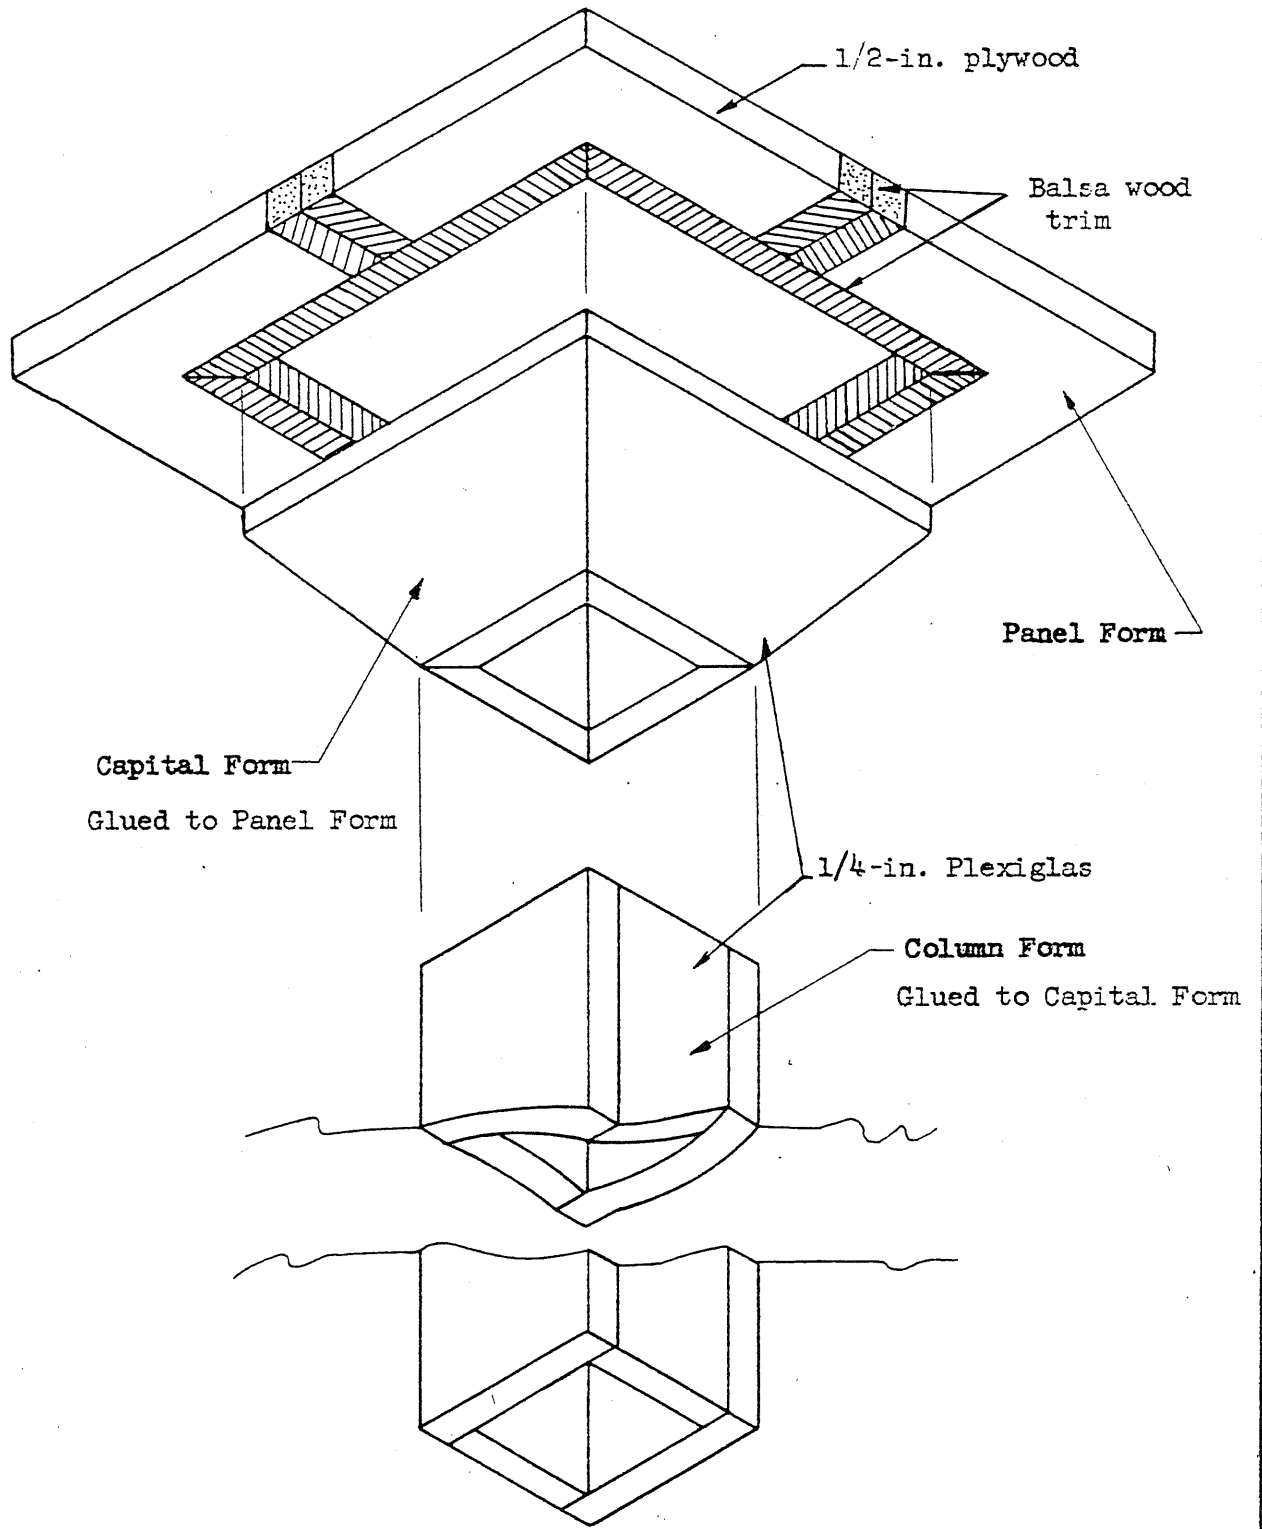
CONNECTION OF COLUMN AND CAPITAL FORMS TO SLAB FORM (INTERIOR COLUMN)
